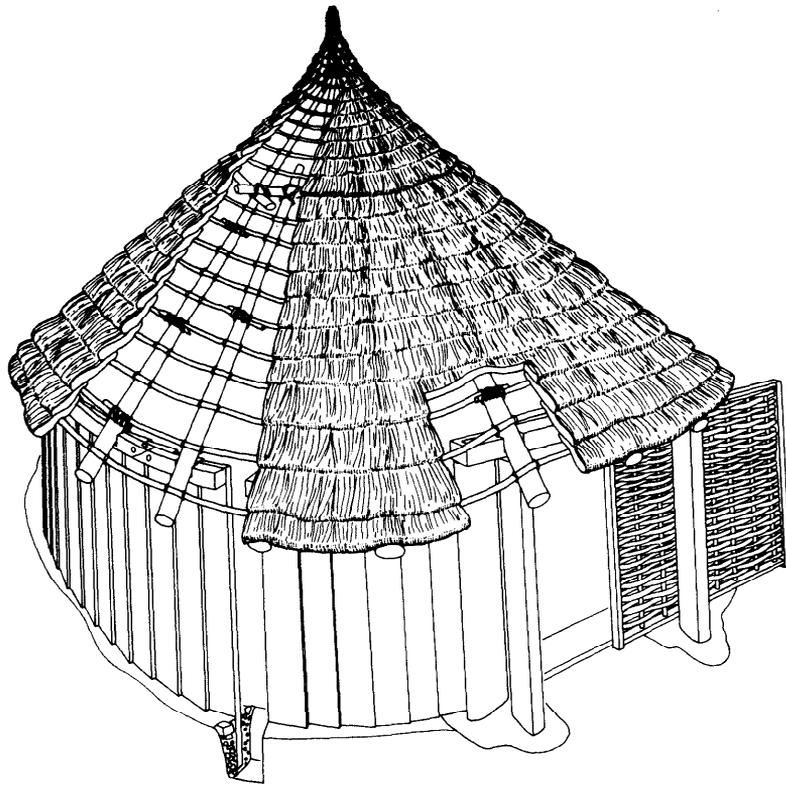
Reconstructions of plank-built and stake-built houses (by Chris Unwin)
